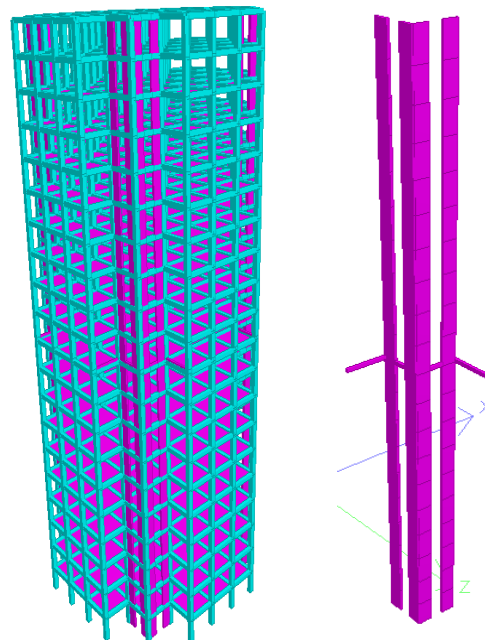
Case WO5a: - (Bay size = 5 m x 4 m & shear wall opening area = 1.66 m x 3.5 m (29.05%))
